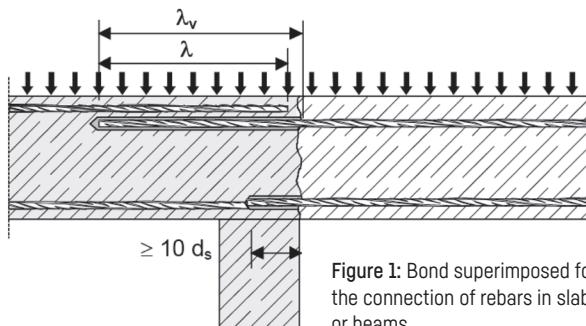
Bond superimposed for the connection of rebars in slabs or beams.
